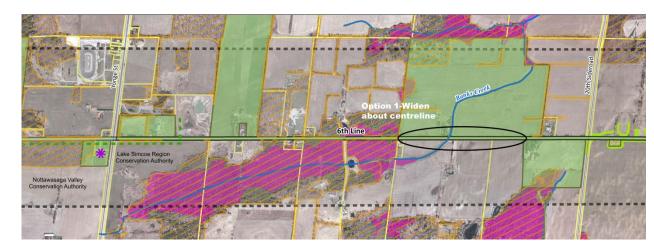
Sub-Section 2-8 - West of Banks Creek to west of 20 Sideroad
